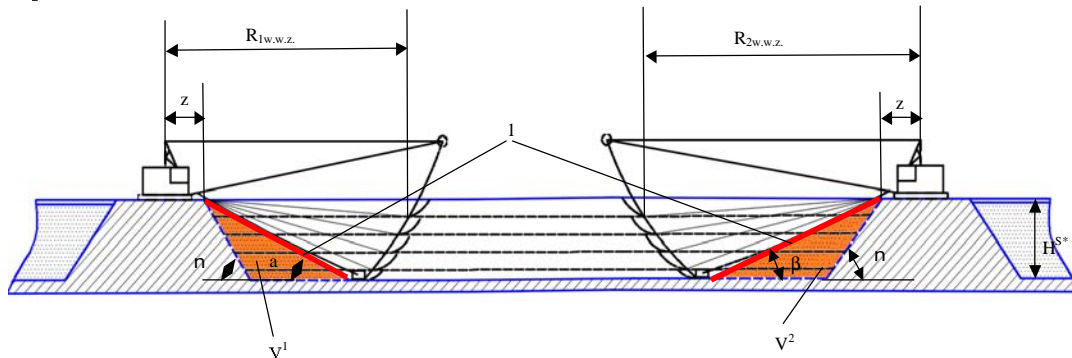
Section development when flattening out slope angles of walls from rocky overburden in i-th section to the bench face angles of the walking dredges: H^S : Section Height (m); $R_{1w.w.z.}$: Radius of the working zone of the 1st dredge (m); $R_{2w.w.z.}$: Radius of the working zone of the 2nd dredge (m); z: safe distance to the bench crest (m); V^1, V^2 , the volume of the required fill (m^3); 1: part of the faces of the walking dredge under research; φ : slope angles of walls from rocky overburden (degrees); α, β : the angles of the part of the faces under research (degrees)
